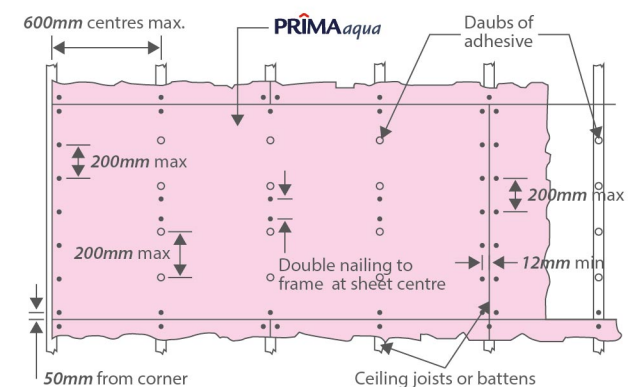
PRIMA^{aqua} Ceiling - Fastener and Adhesive Fixed
